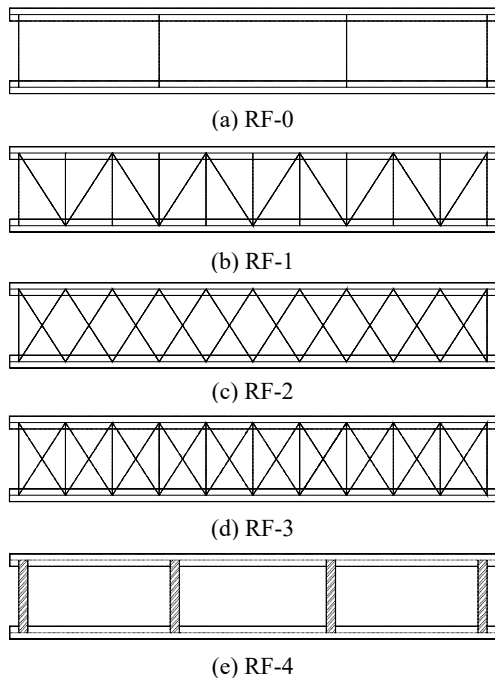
Types of transverse reinforcement at lower flange of ballastless railway plate girder bridge<sup>[3]</sup>
